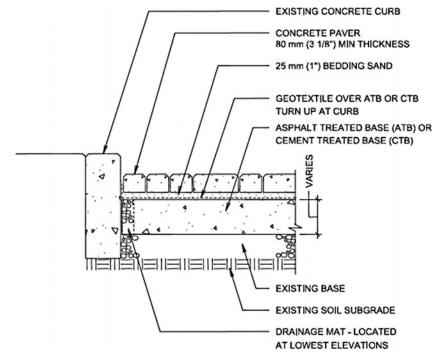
Drain Detail for Pavers over Treated Base.
